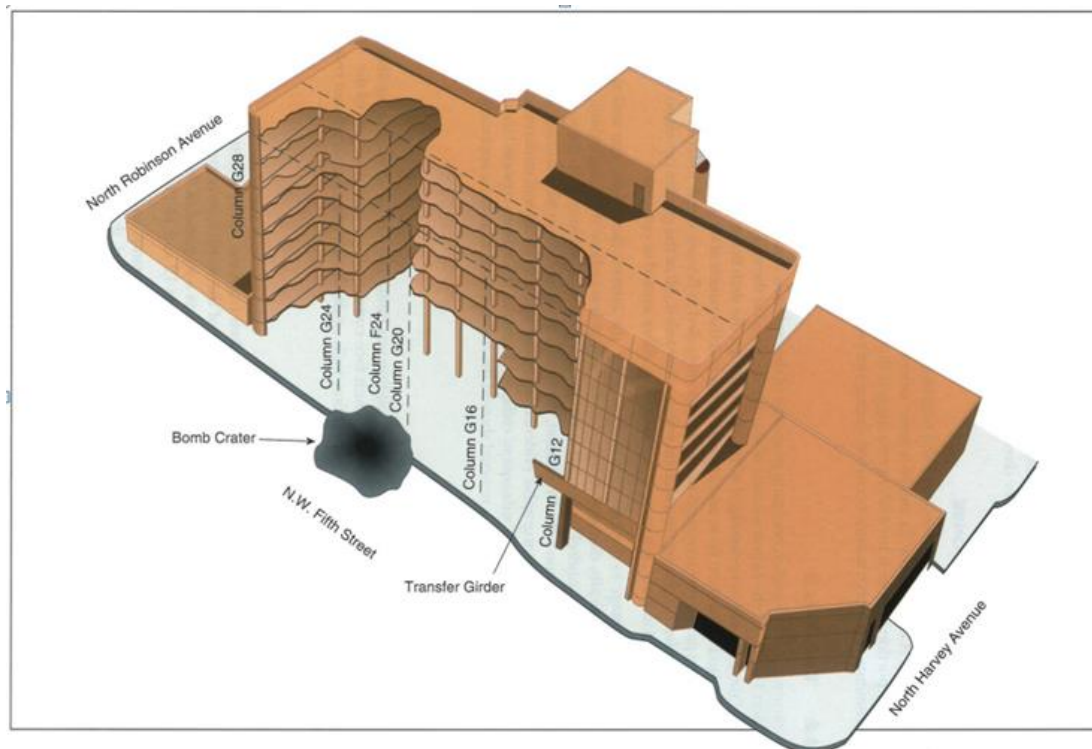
Post Failure Layout, Alfred P. Murrah Building.
